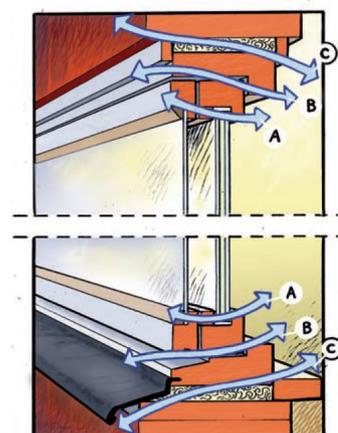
Heat and cold enter and escape through windows in three ways: between the glass and the frame (A), between the frame and the casement (B) and between the casement and the wall (C). Heat also escapes through the glass itself.
